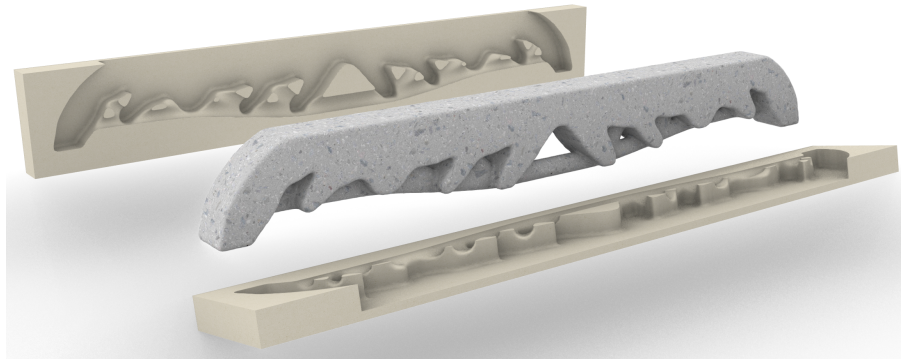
Illustration of a proposed fabrication process for a VTS designed structure. Both pieces of a two-part mold could be placed together to be filled with concrete, which would be released after an initial curing period.
